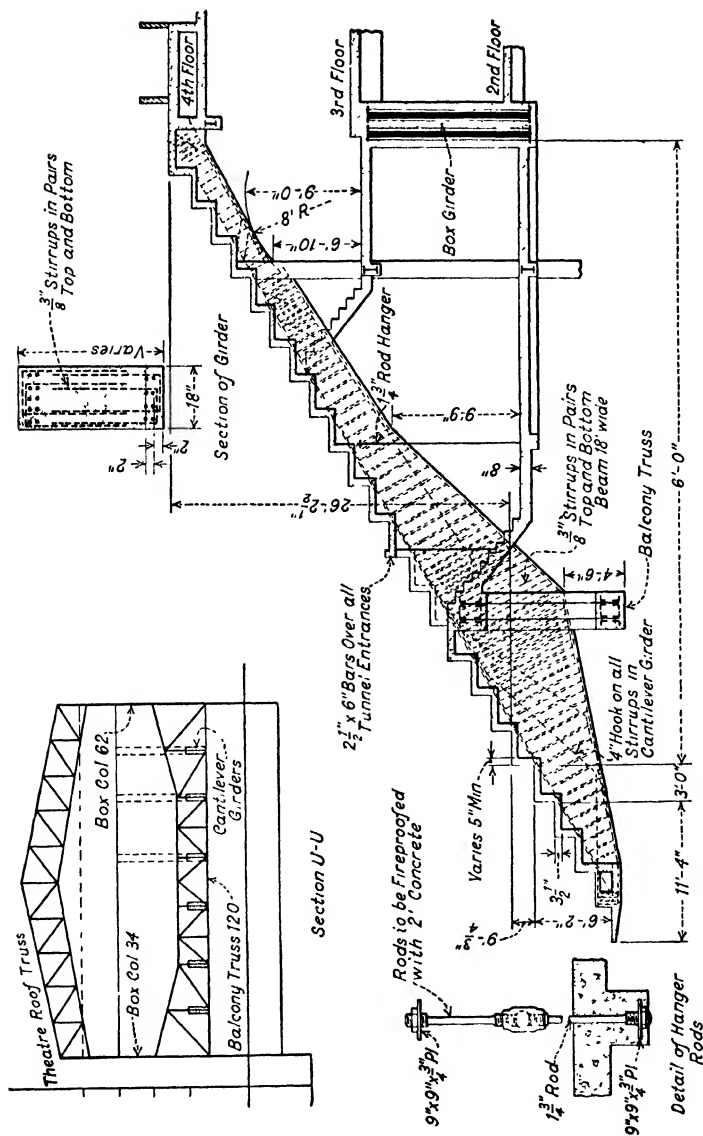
Reinforced Concrete Cantilever Supported by Steel Fulcrum Truss. (See p. 778.)
